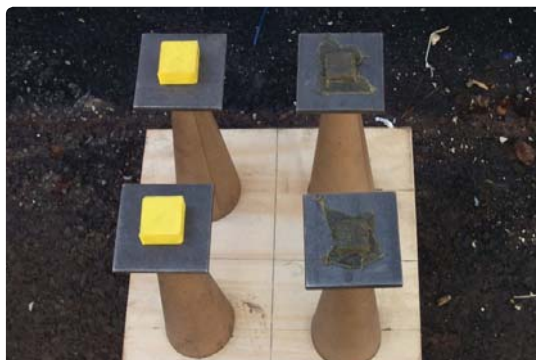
Boltcracker – enclosing the head of the holding down bolts (left of picture); oil-based tape (current method) attached to head of bolts (right of picture).
